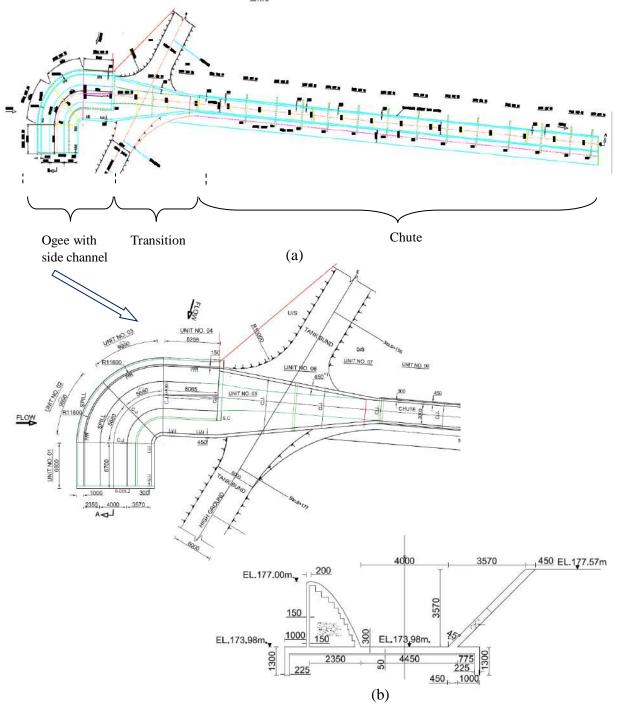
(a) Plan View, (b) Sectional View of Ogee Spill with Side Channel and the Chute
